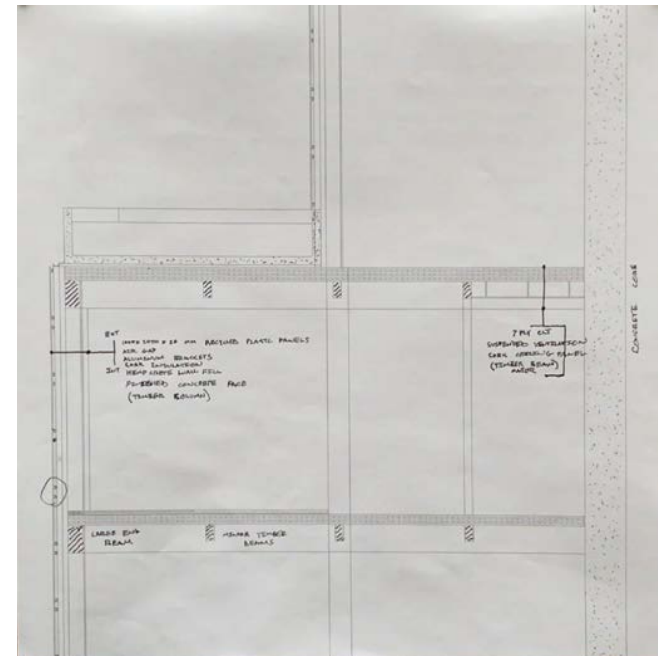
& 67: Team V Architecture, "Haut", 2022, <https://www.archdaily.com/989552/haut-amsterdam-residential-building-team-v-architecture>
